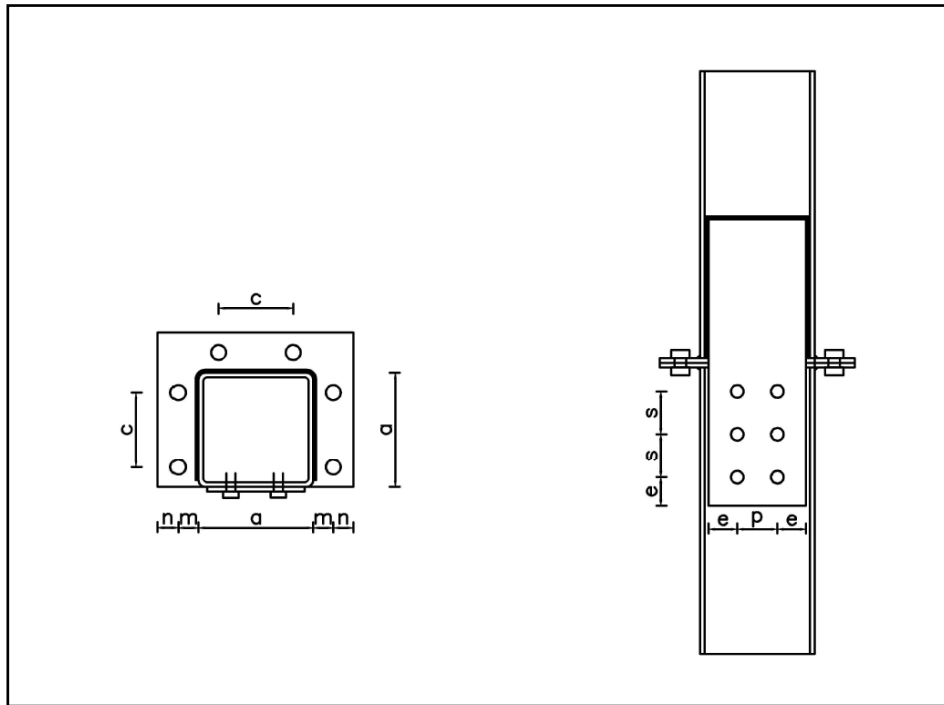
Plan and elevation of non-symmetrical intermediate splice connection
